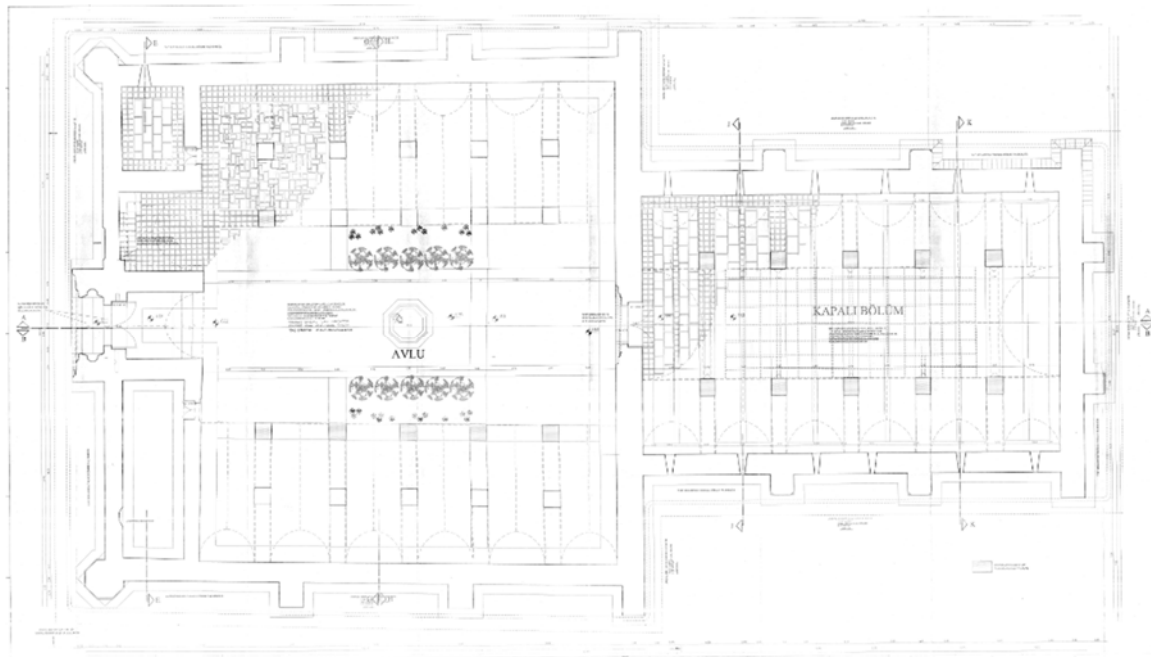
; Tokat - Pazar Mahperi Hatun Caravanserai Building Survey
